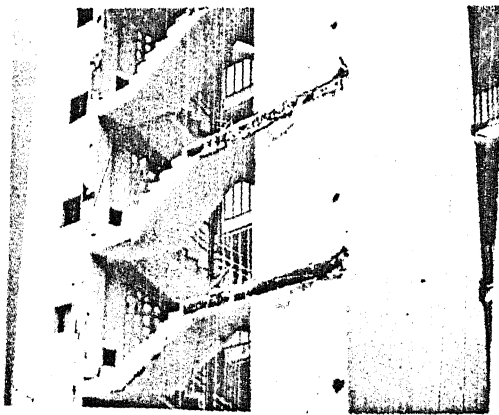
Paper Separators in Joint, Palace Corvin Building
